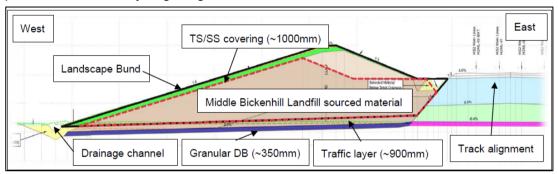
Cross section of Pool Wood Embankment Showing Main Design Elements
